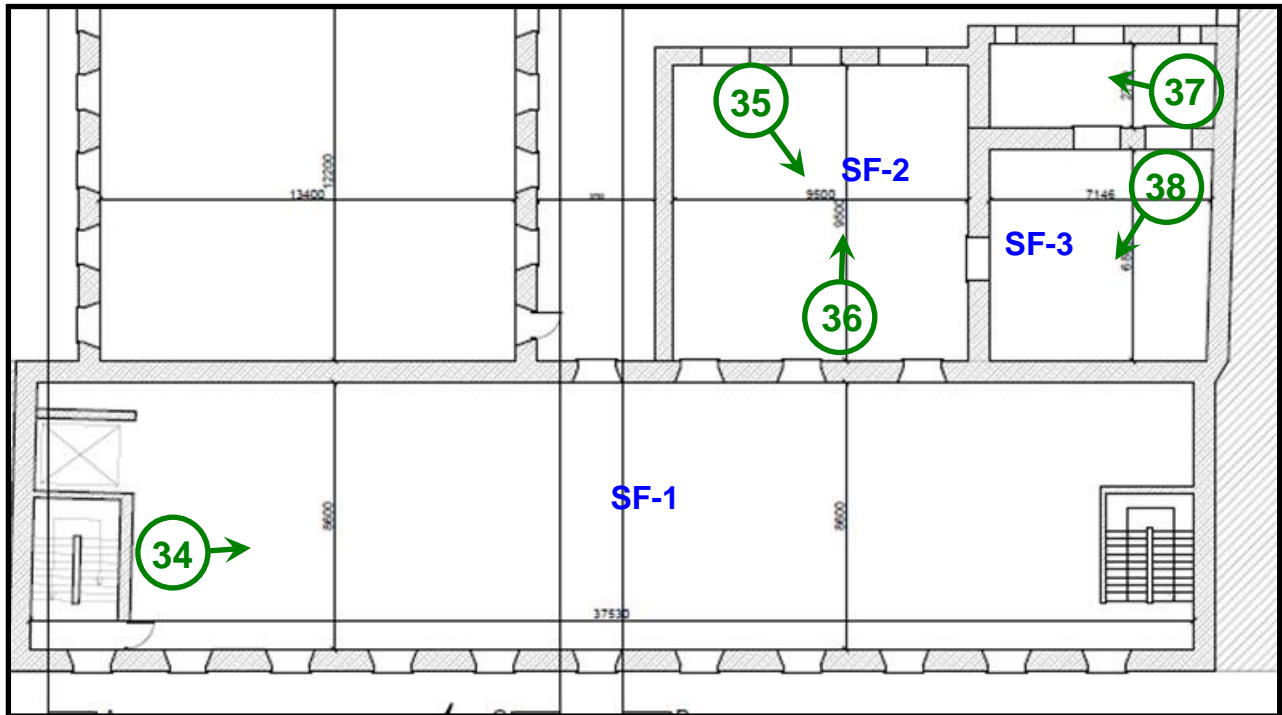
Second-floor plan of front building with room numbers and photograph locations
